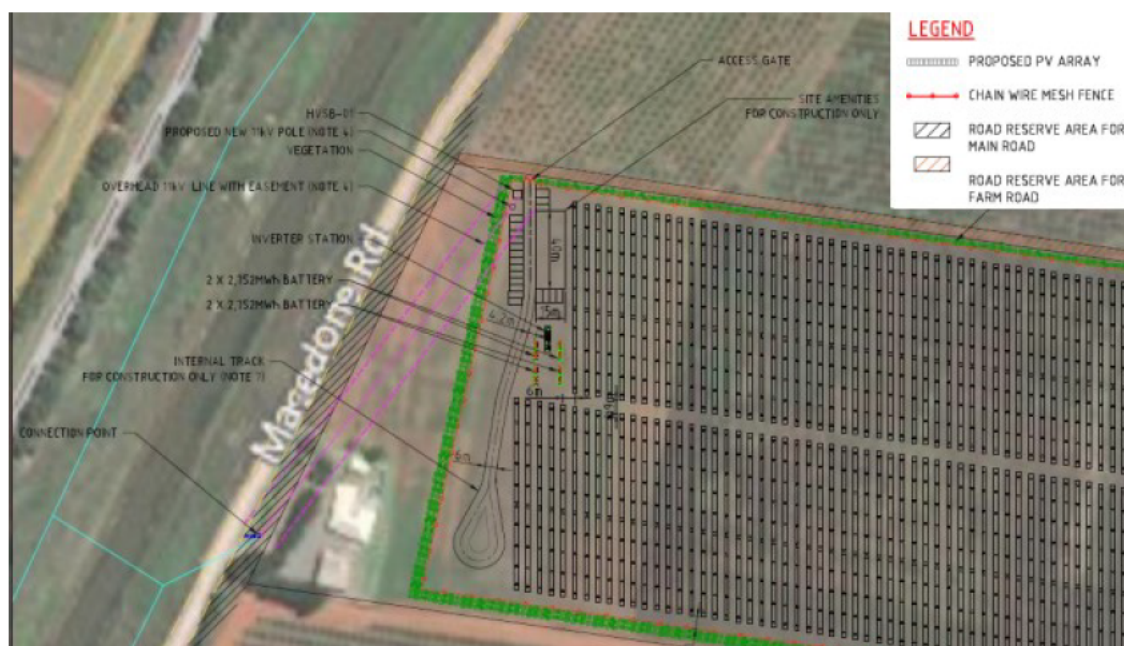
Underground HV Work in Purple (Source: Application Common Material).
